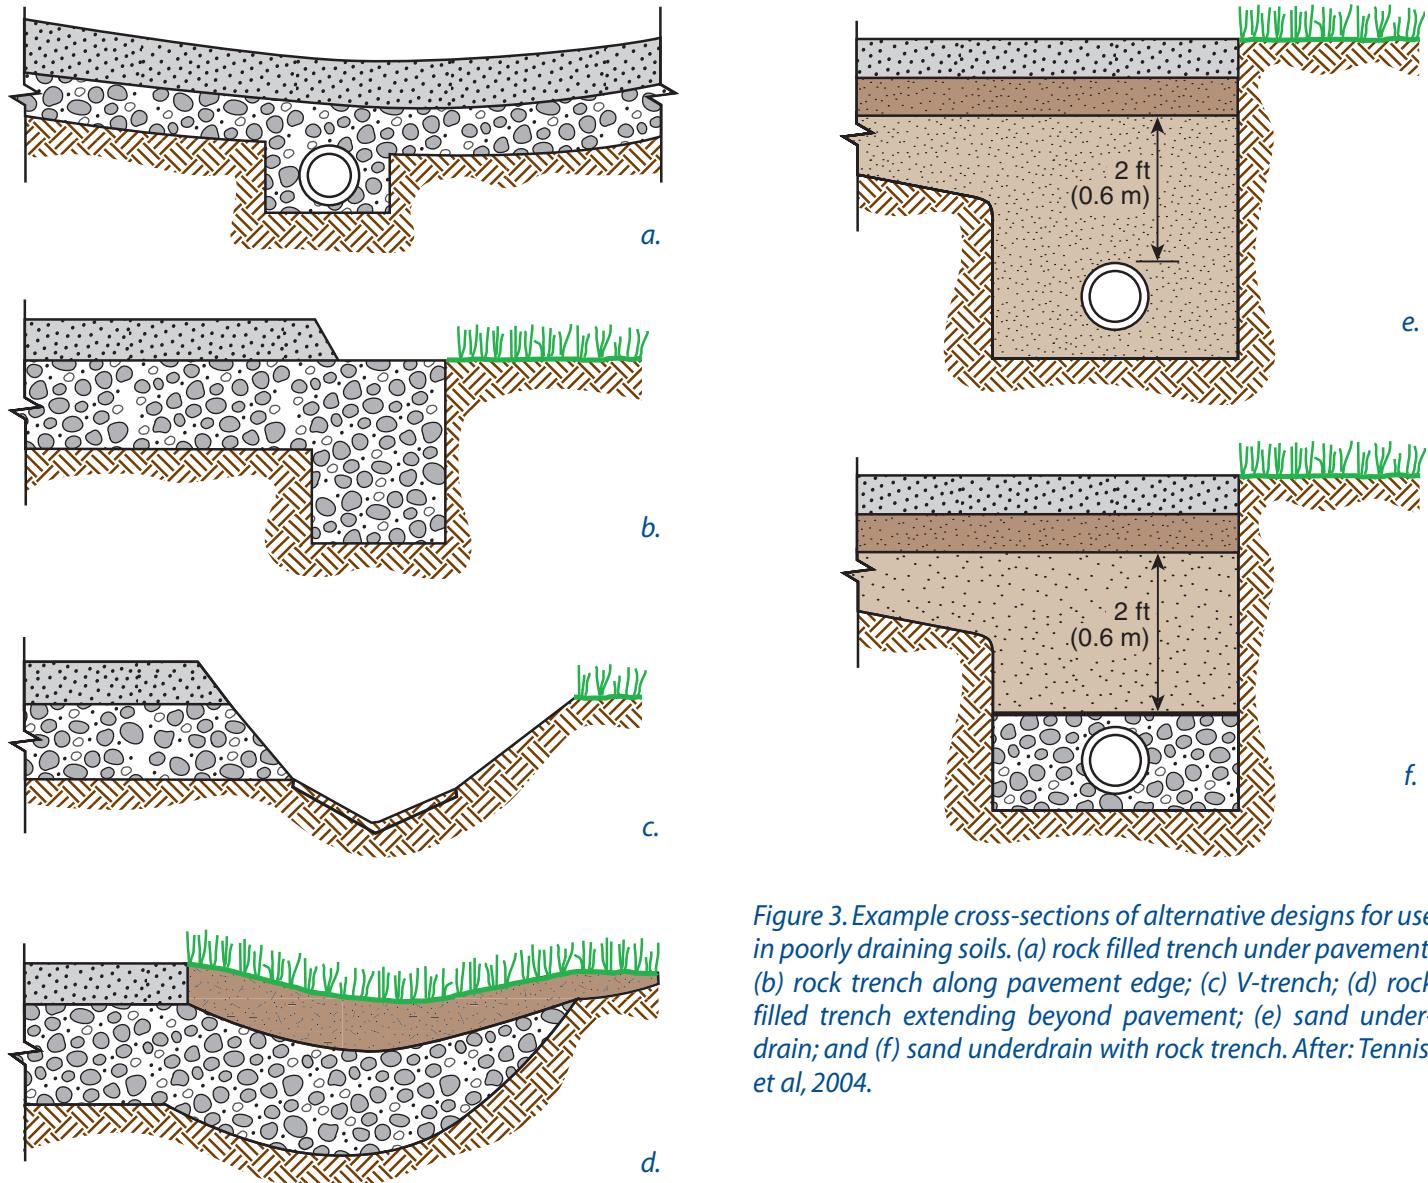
Example cross-sections of alternative designs for use in poorly draining soils. (a) rock filled trench under pavement; (b) rock trench along pavement edge; (c) V-trench; (d) rock filled trench extending beyond pavement; (e) sand under-drain; and (f) sand underdrain with rock trench. After: Tennis, et al, 2004.
